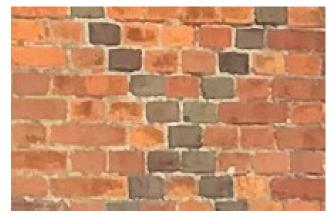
Red brick with with blue diaper work detail of the Village Hall facade
